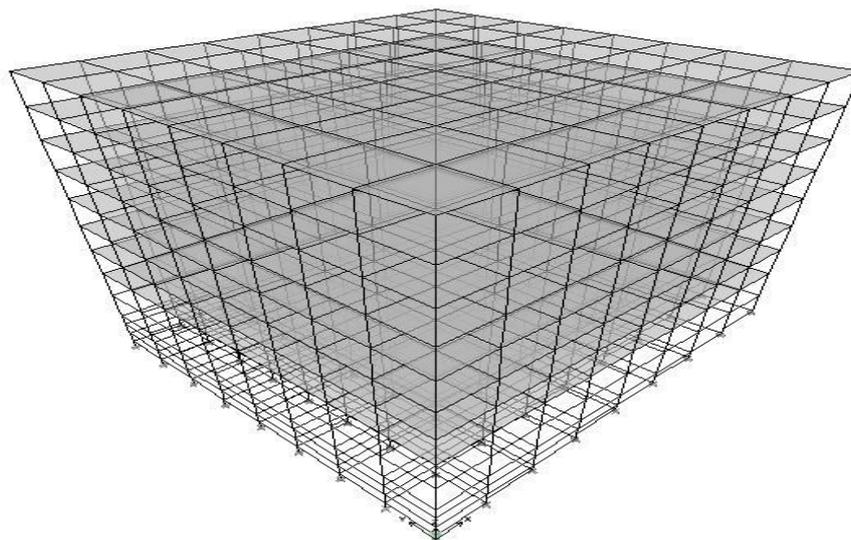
STEP BACK BUILDINGS WITH 10° SLOPE (STOREY 8, 9, 10)
